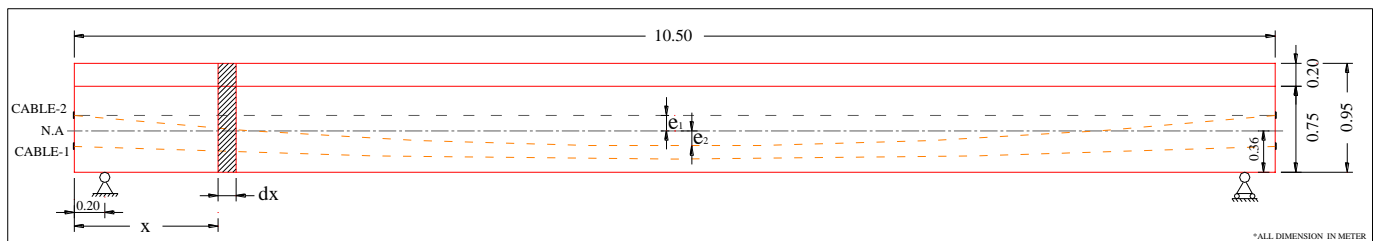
Layout of Prestressed simply supported beam with parabolic prestressing cables profile
